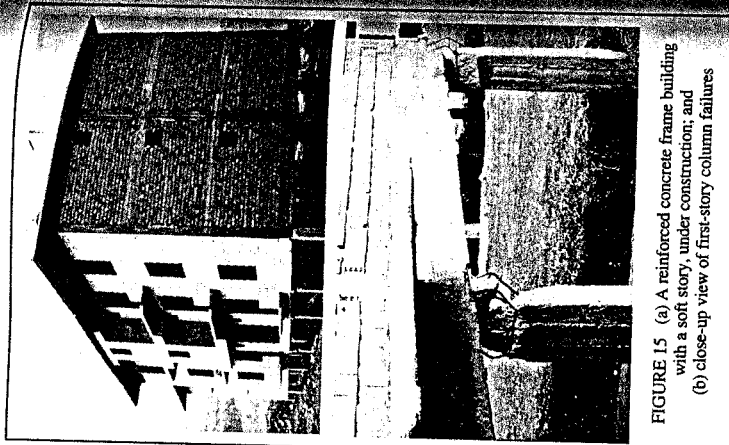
(a) A reinforced concrete frame building with a soft story, under construction; and (b) close-up view of first-story column failures
